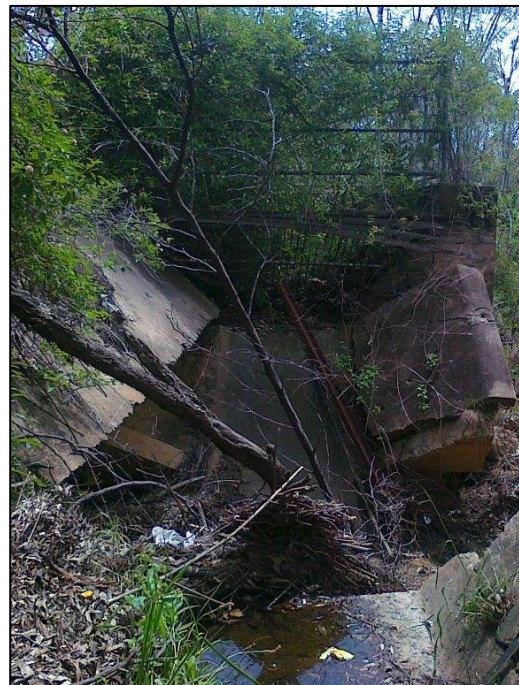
Channel west of Moorebank Avenue in MPW site
